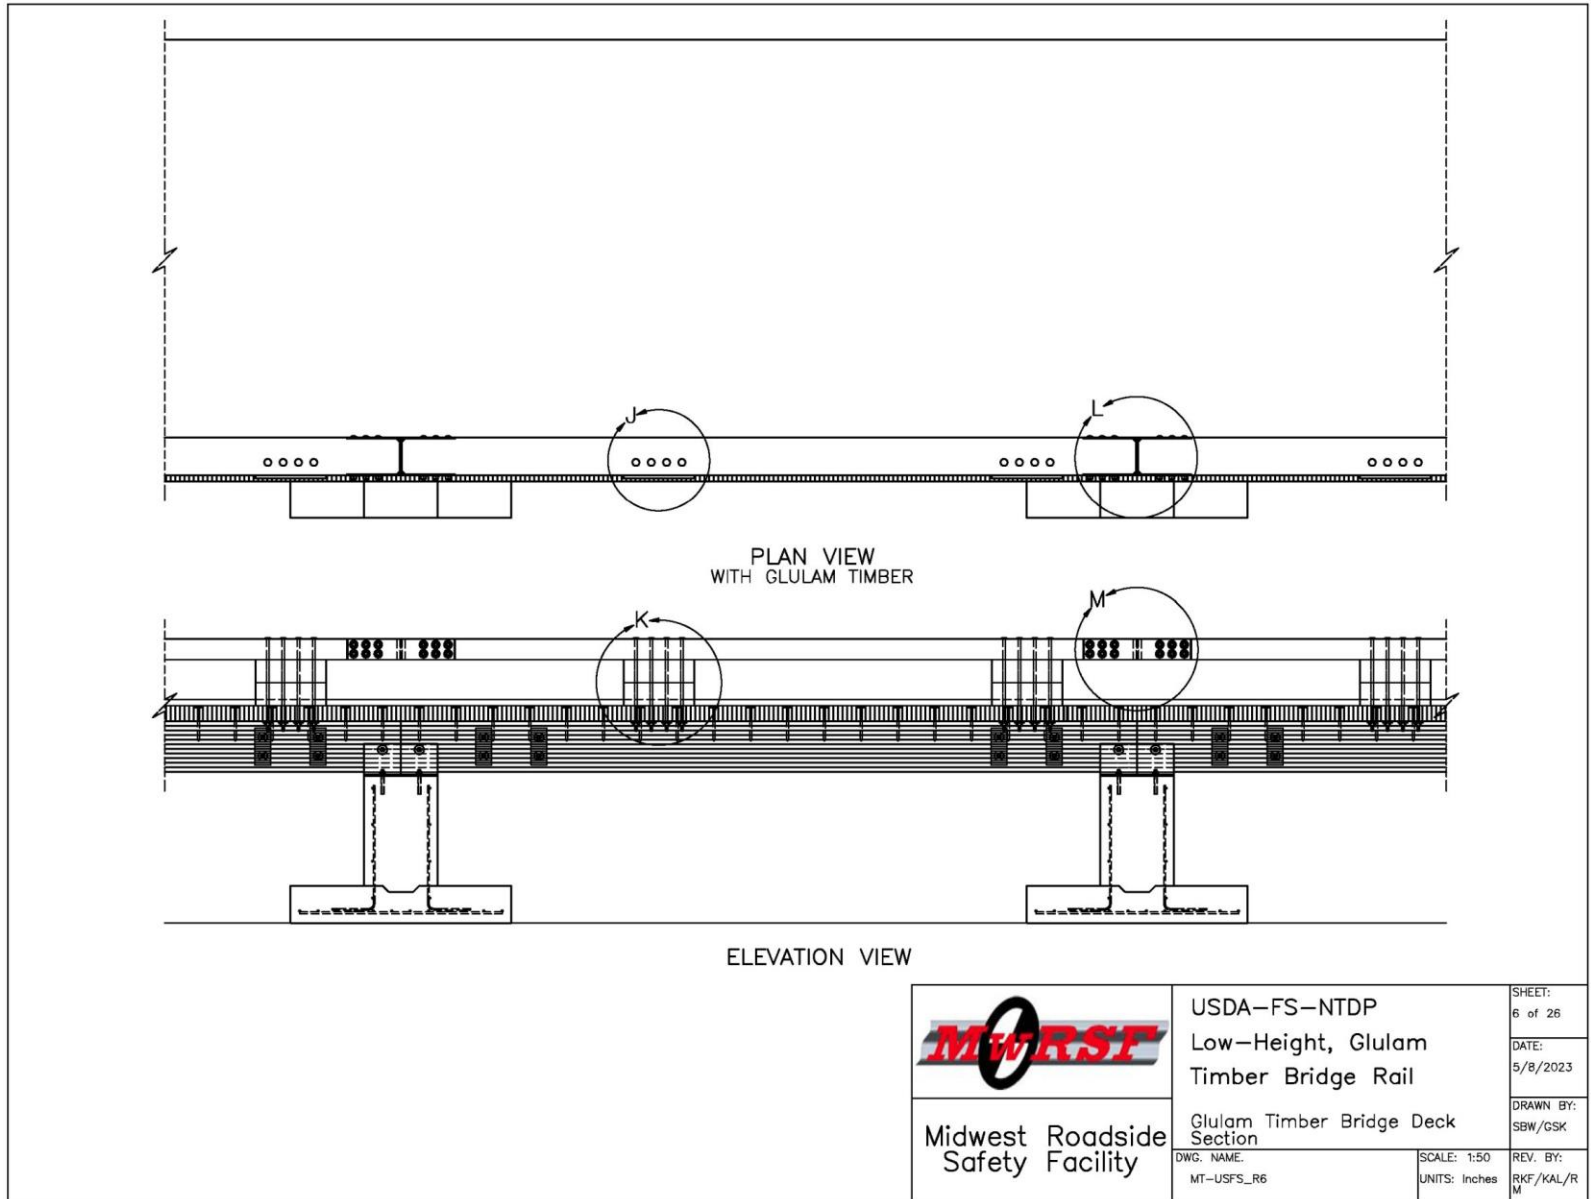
USDA-FS-NTDP Low-Height, Glulam Timber Bridge Rail: Glulam Timber Bridge Deck Section
